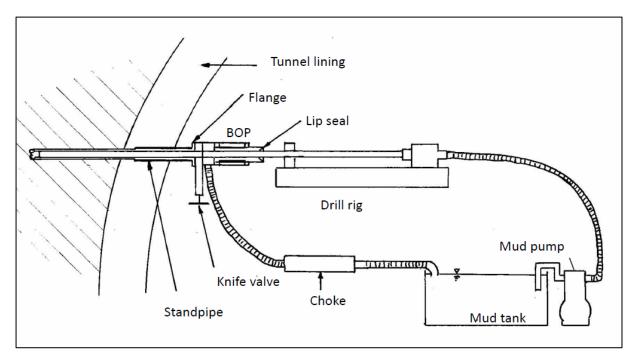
Schematic layout of drilling equipment used in the Liang Tang tunnels.
